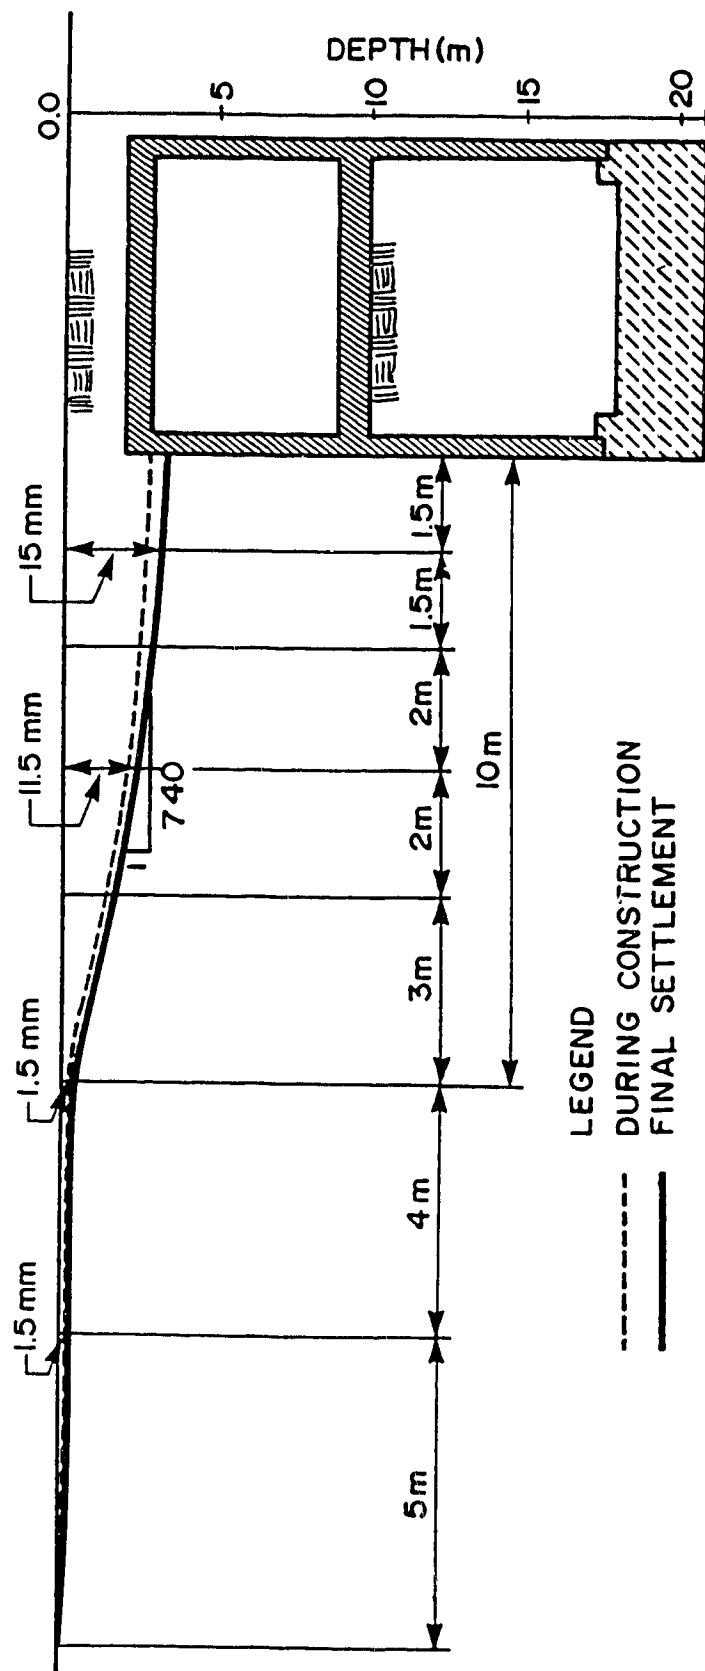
The Observed Settlement Troughs at the Tunnel Test Section
